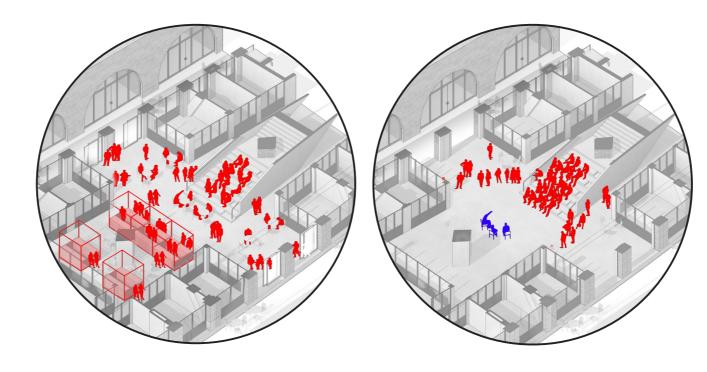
Publicly Accessible Open Space second floor axonometric diagram
